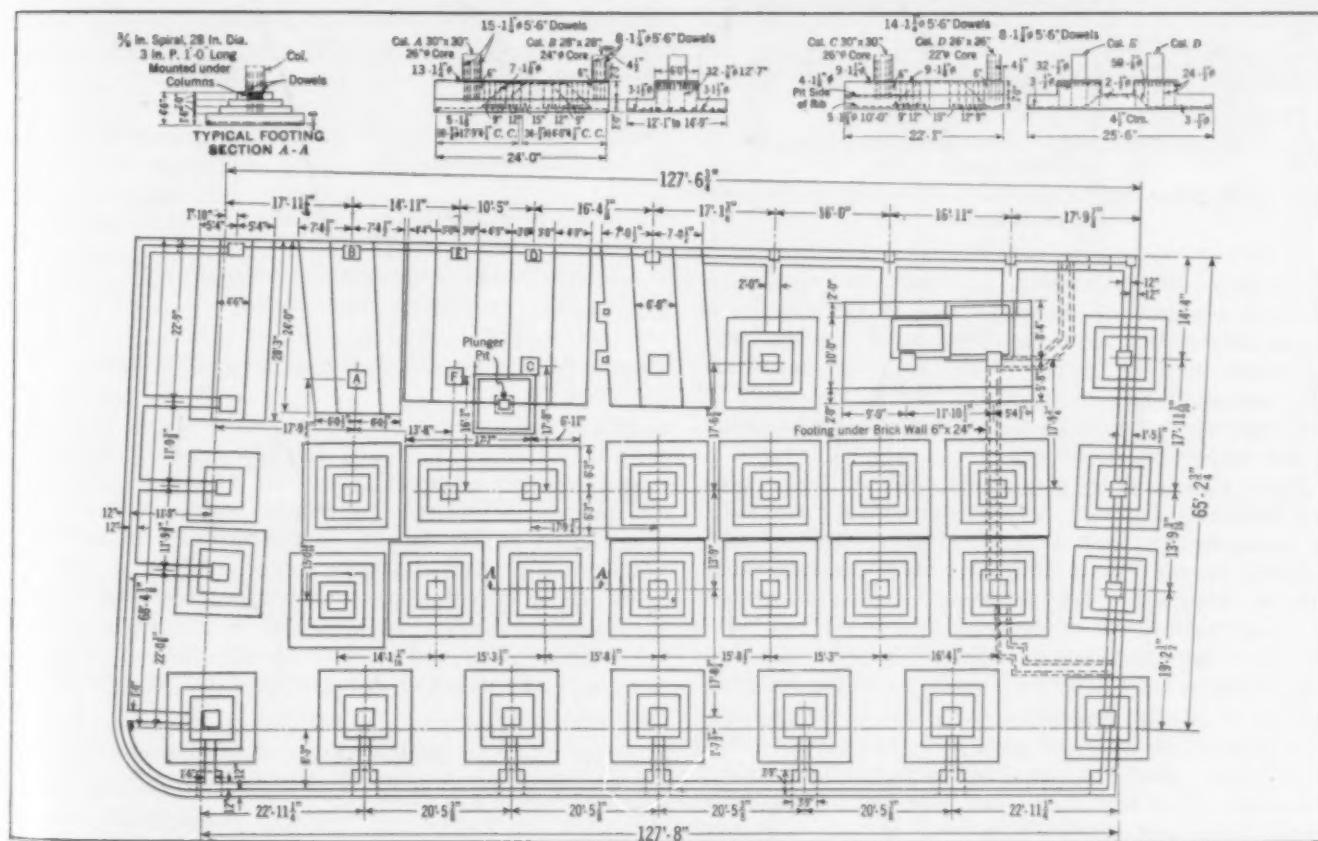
FOUNDATION PLAN, MAYFAIR HOTEL, ST. LOUIS
